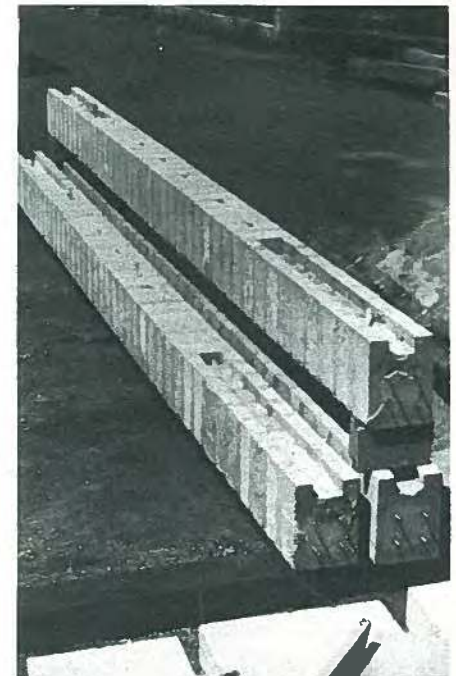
12 x 16-in. (305 x 406 mm) building beams with grouted strands. Note slot for continuity steel in 12 x 16-in. (305 x 406 mm) block.
